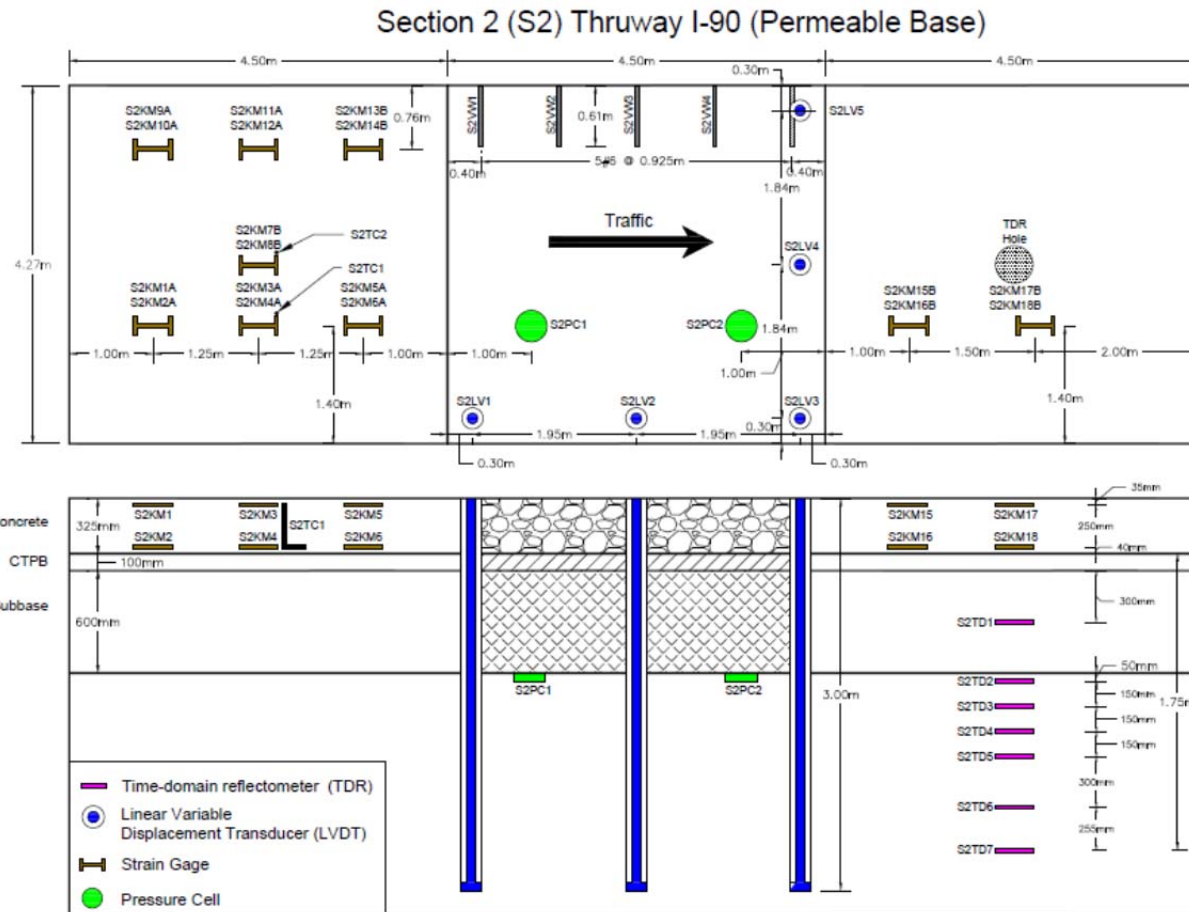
Section 2 instrumentation plan and profile (1m = 3.28 ft)
